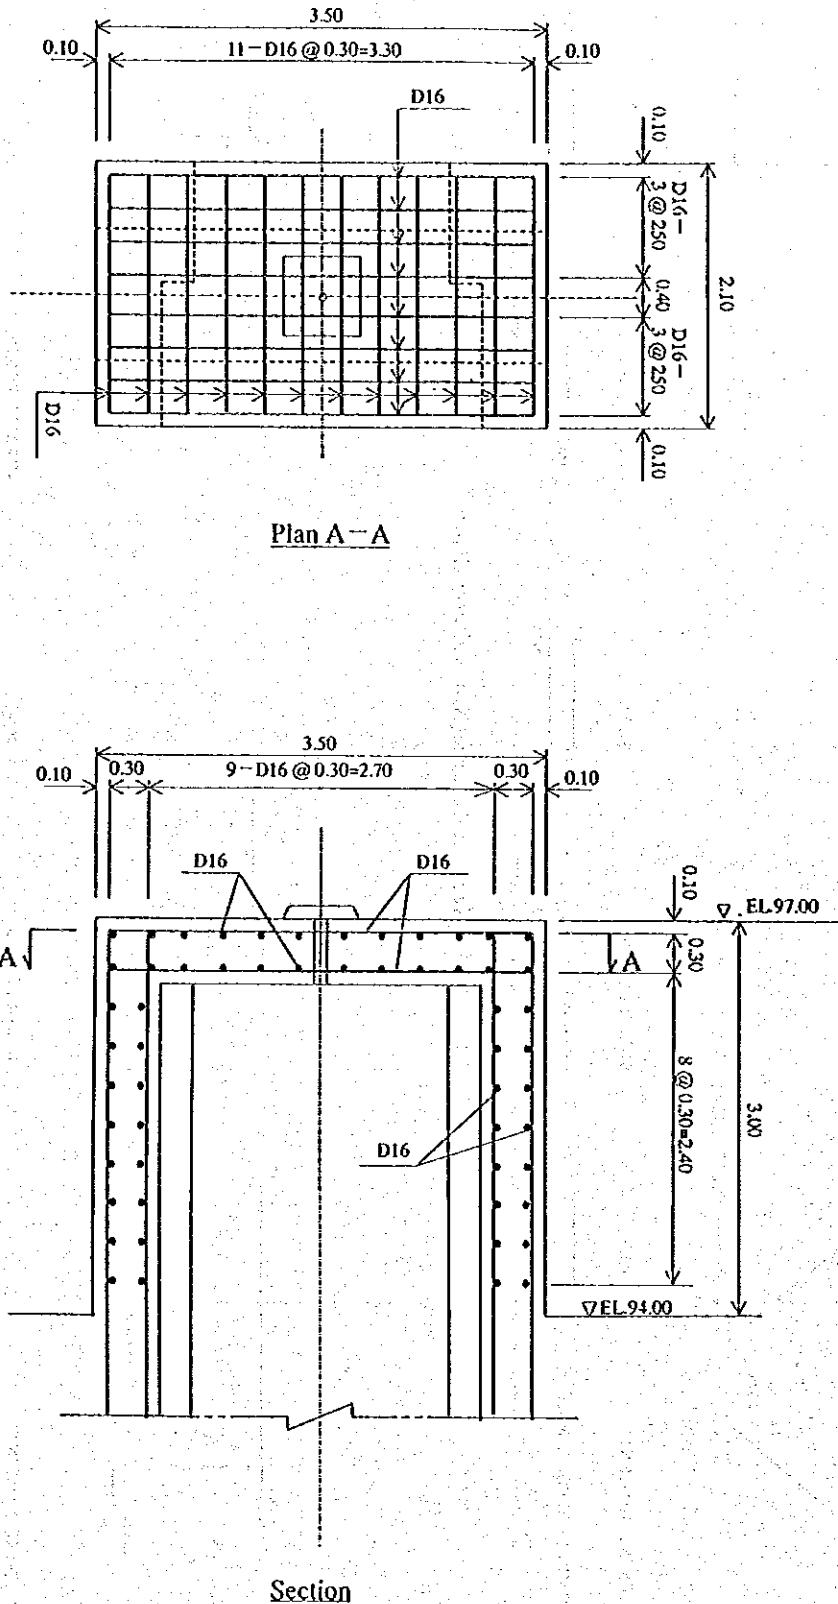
Reinforcement Arrangement of Gate Tower
